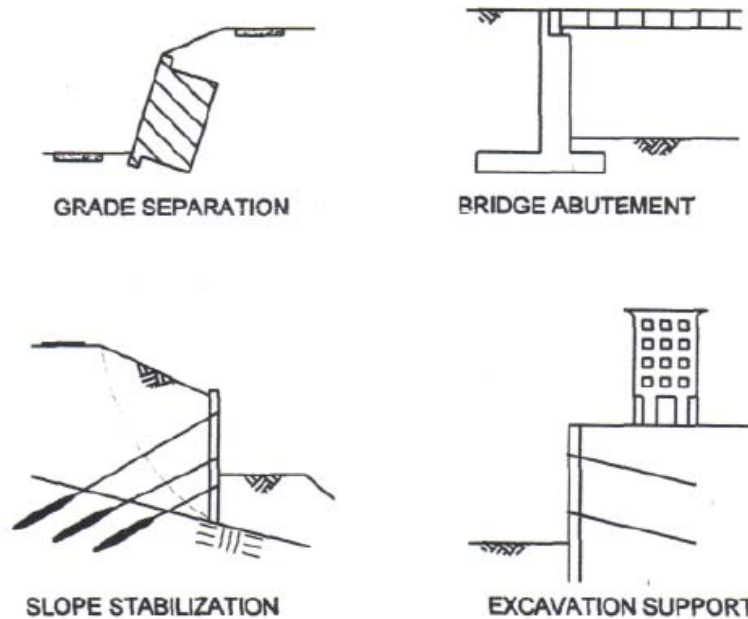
APPLICATIONS OF EARTH RETAINING SYSTEMS
